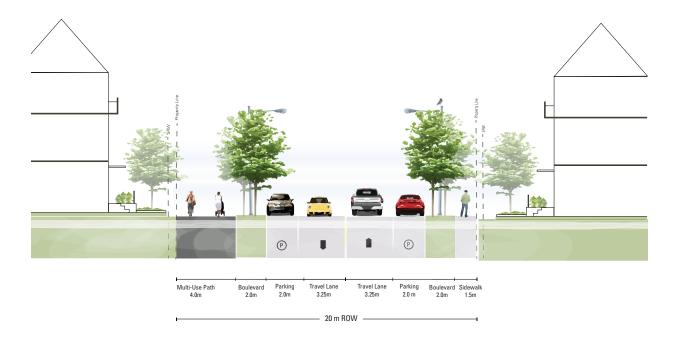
174 Street at 16 Avenue - 20 m Road Allowance
